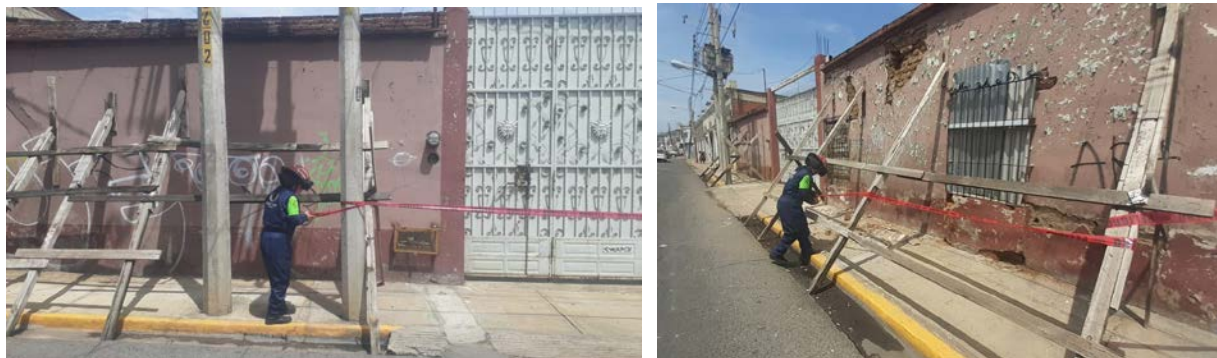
Damage and temporary propping of a masonry wall (Twitter, 2020r).
